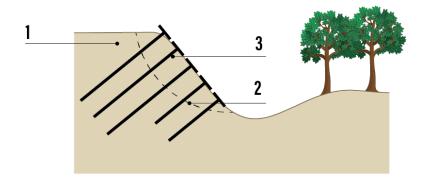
A cross-section through an unstable slope (1). A potential curved slip surface (2) is prevented from sliding by steel bar ground anchors (3) drilled and concreted into the slope.
